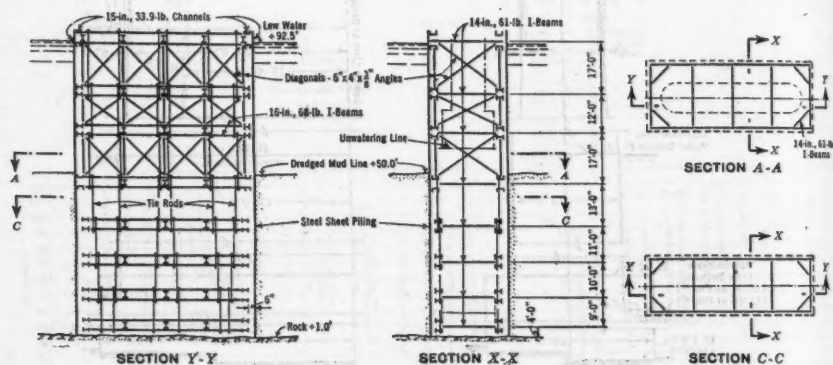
COFFER-DAM BRACINGS, PIERS 6 AND 7.
